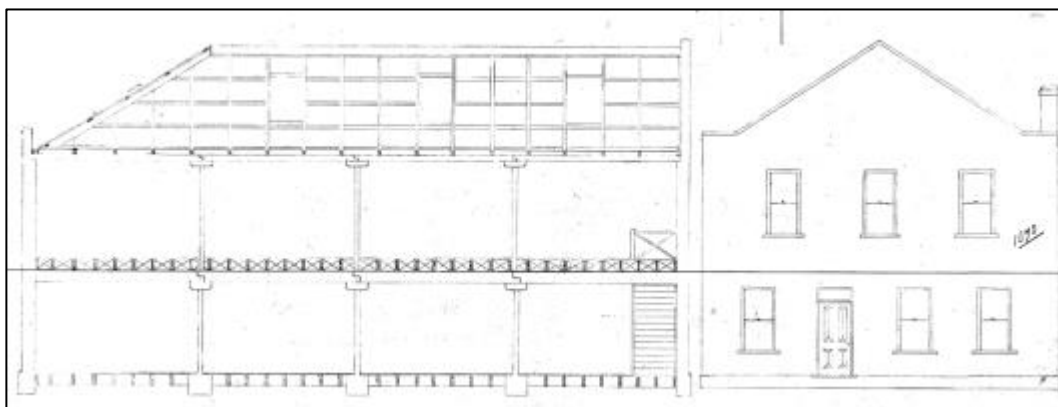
1904 plan for a second story for the brick building on Section 71 (DCC Archives).
